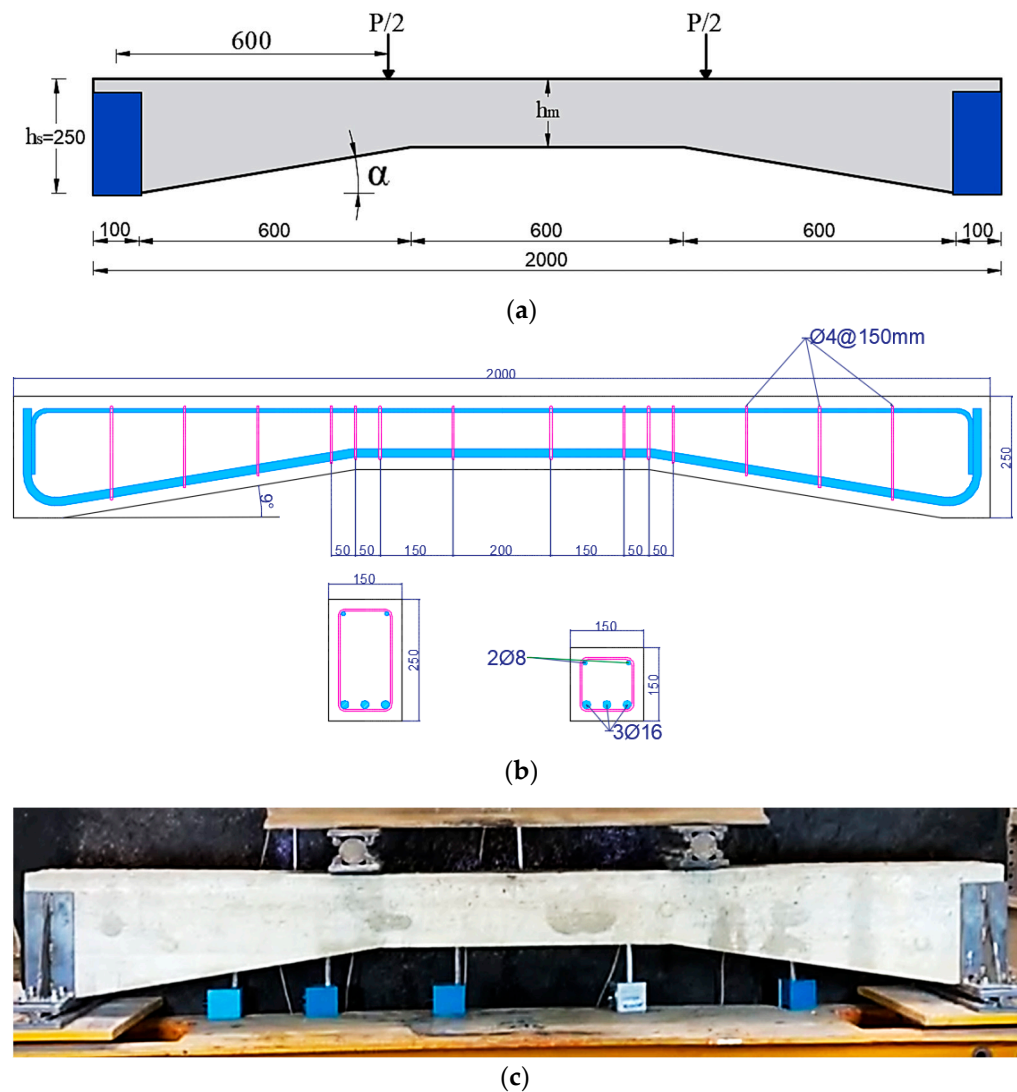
Details of the studied Beam: (a) Beam geometry, (b) Reinforcement details, (c) Experimental test setup.
